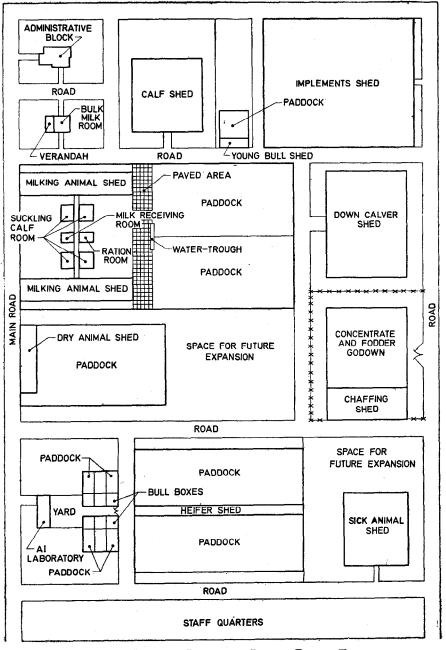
B LAYOUT PLAN FOR LARGE DAIRY FARMS
